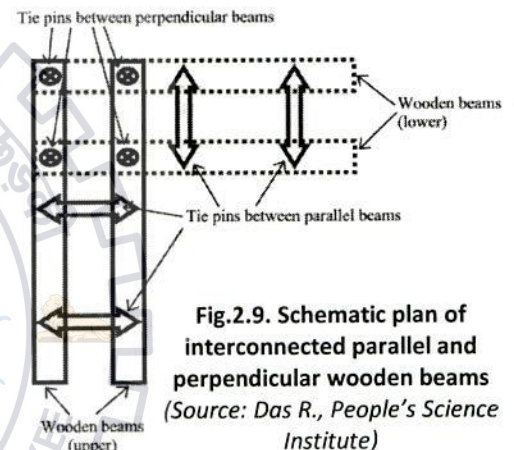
Schematic plan of interconnected parallel and perpendicular wooden beams
